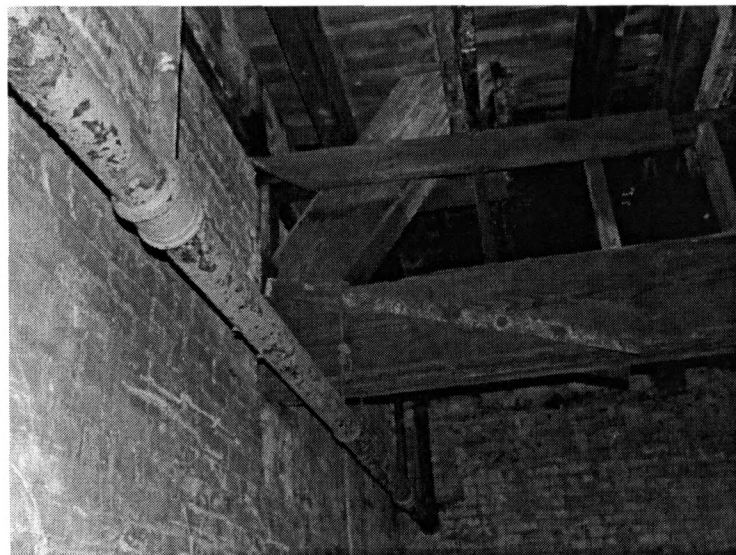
End of roof truss system in engine room, note spacers on lower chord to support floor, view east
